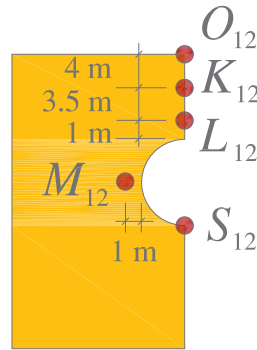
Observed points in cross-section 12 during the excavation of the shallow tunnel.
